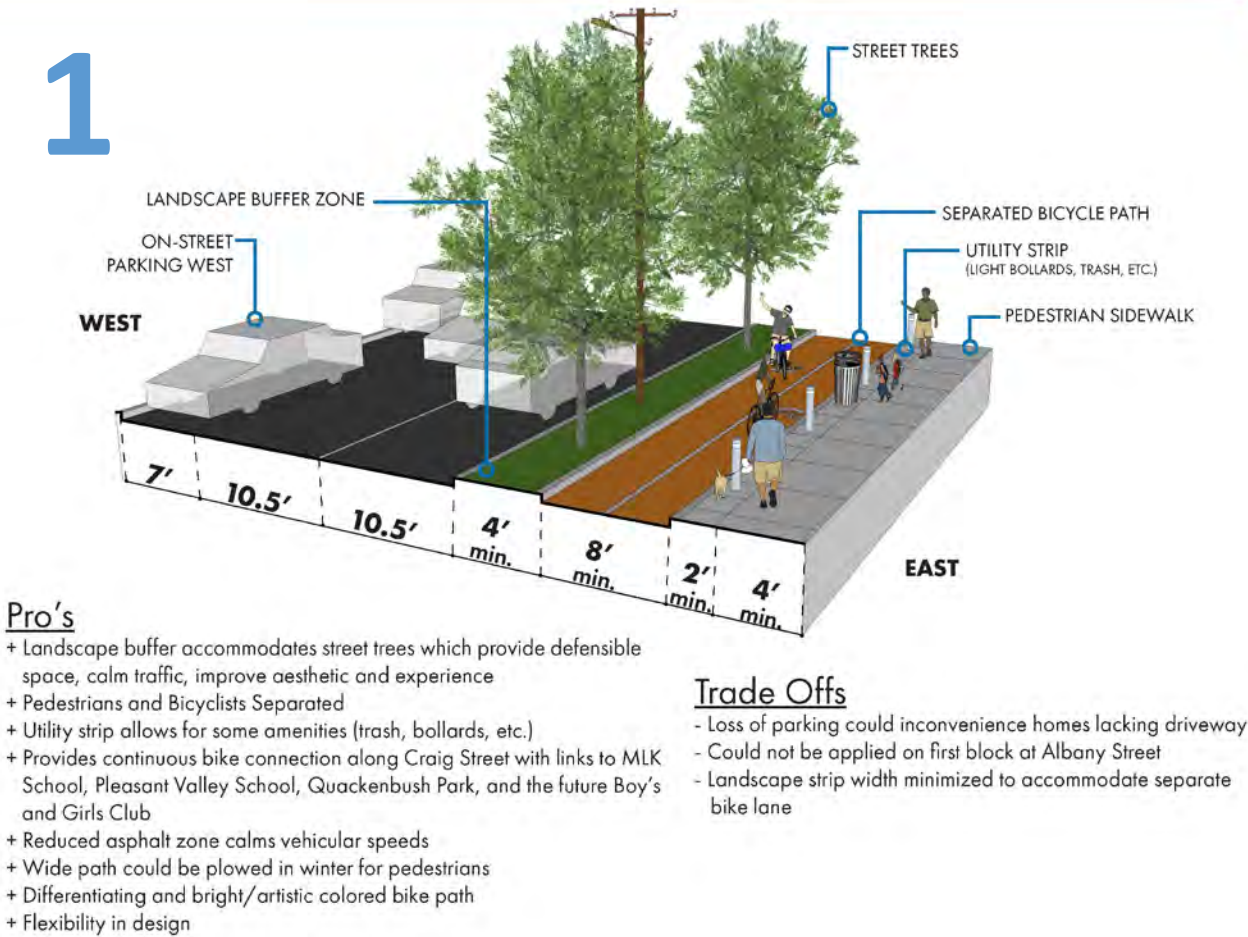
Craig Street Option 1: On Street Parking West and Two-Way Cycle Track and Sidewalk East
